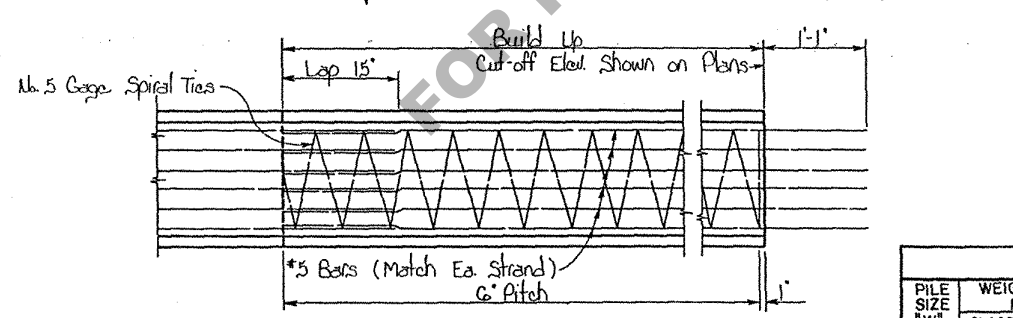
& 20 INCH SQ. PRECAST REINFORCED CONCRETE PILES
